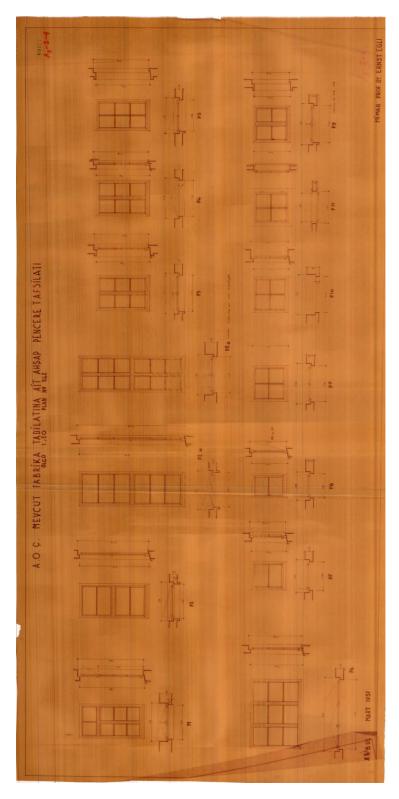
The original drawings of the brewery, windows details (Source T.T.A. Archive)
